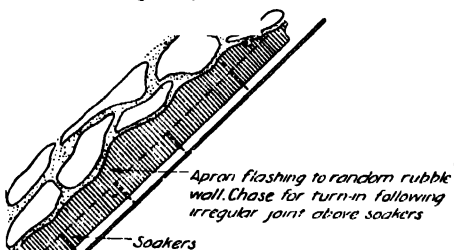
Method of flashing junction of slated roof and random rubble wall, cover flashing being fixed to nearest joint parallel to slates.
